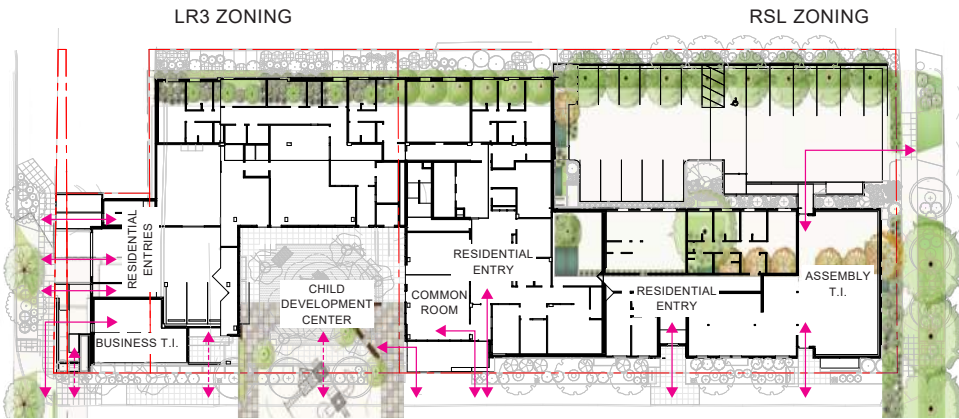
Plan showing locations of entries and strong visual connections. General layout of building massing is also apparent.
